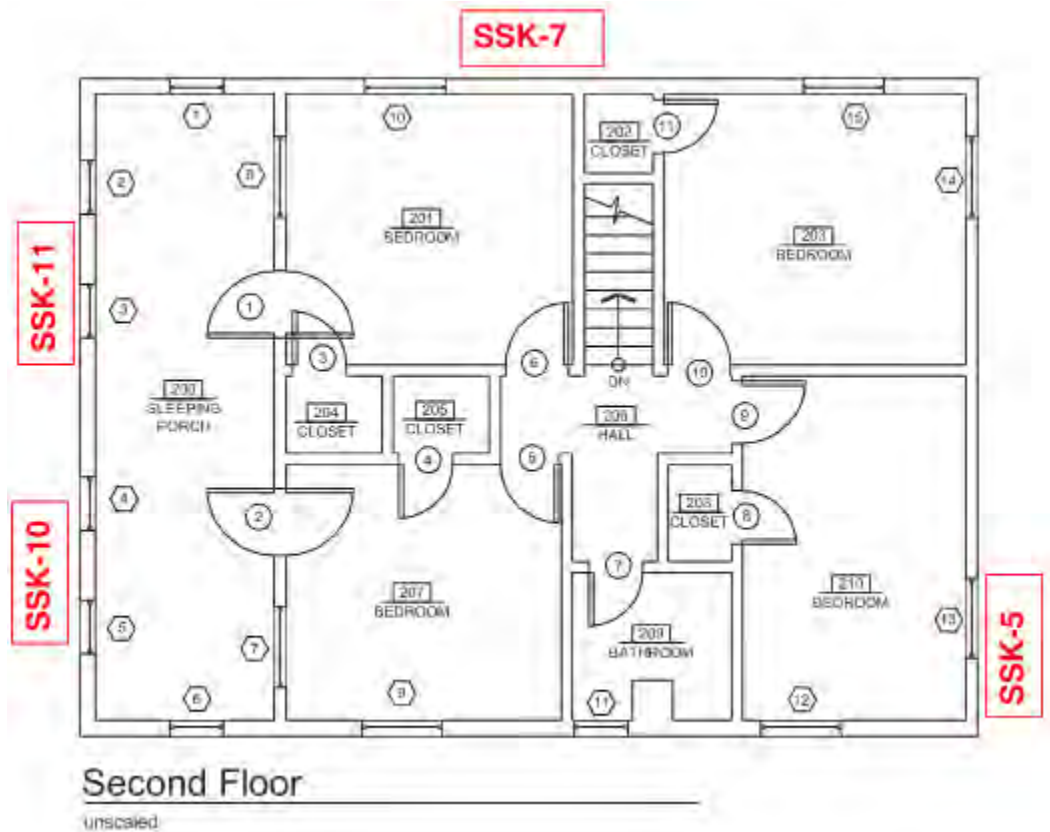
Second Floor Temporary Immediate Repair Sketch Locations
